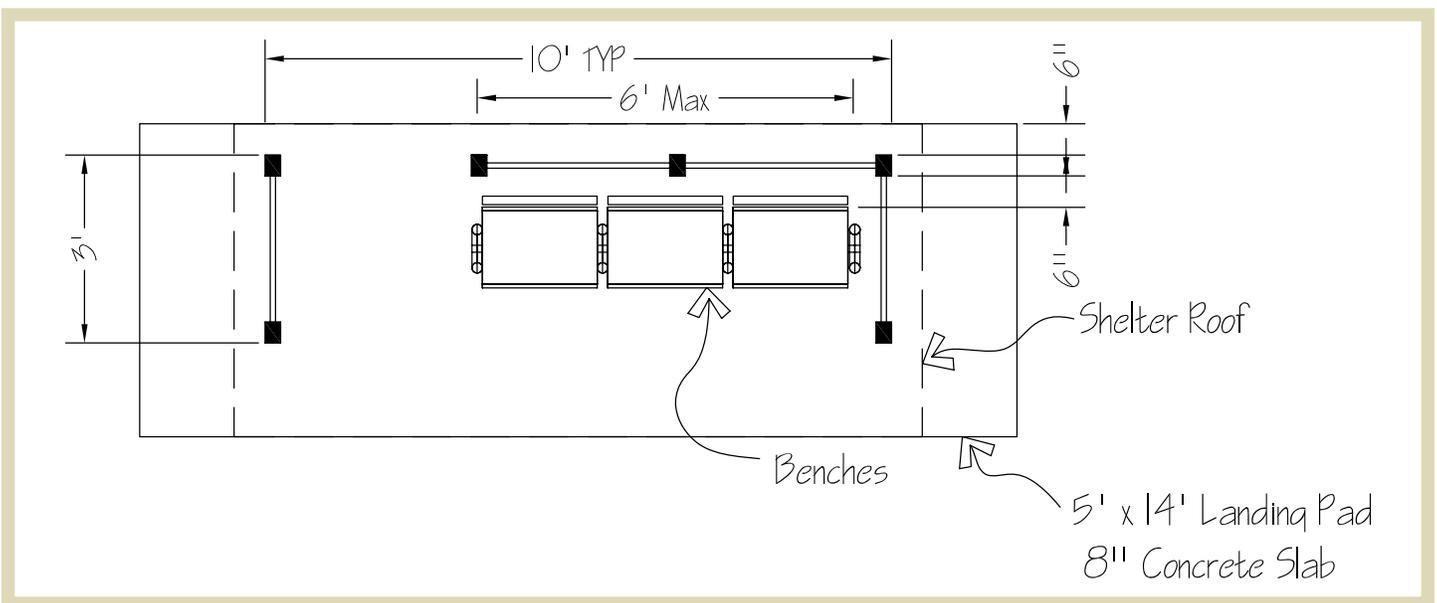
| Typical dimensions of a small bus shelter with seating.
